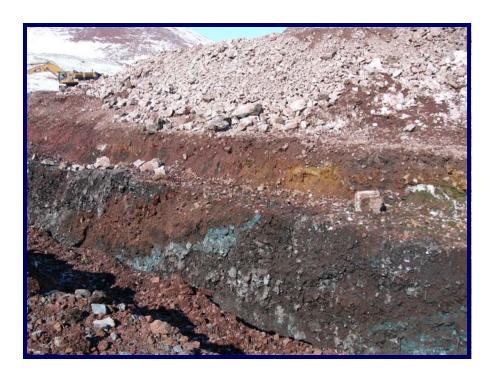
May 21, 2005 Left hand sidewall of spillway excavation in chute. Note weathered and altered diabase material in sidewall of excavation.
